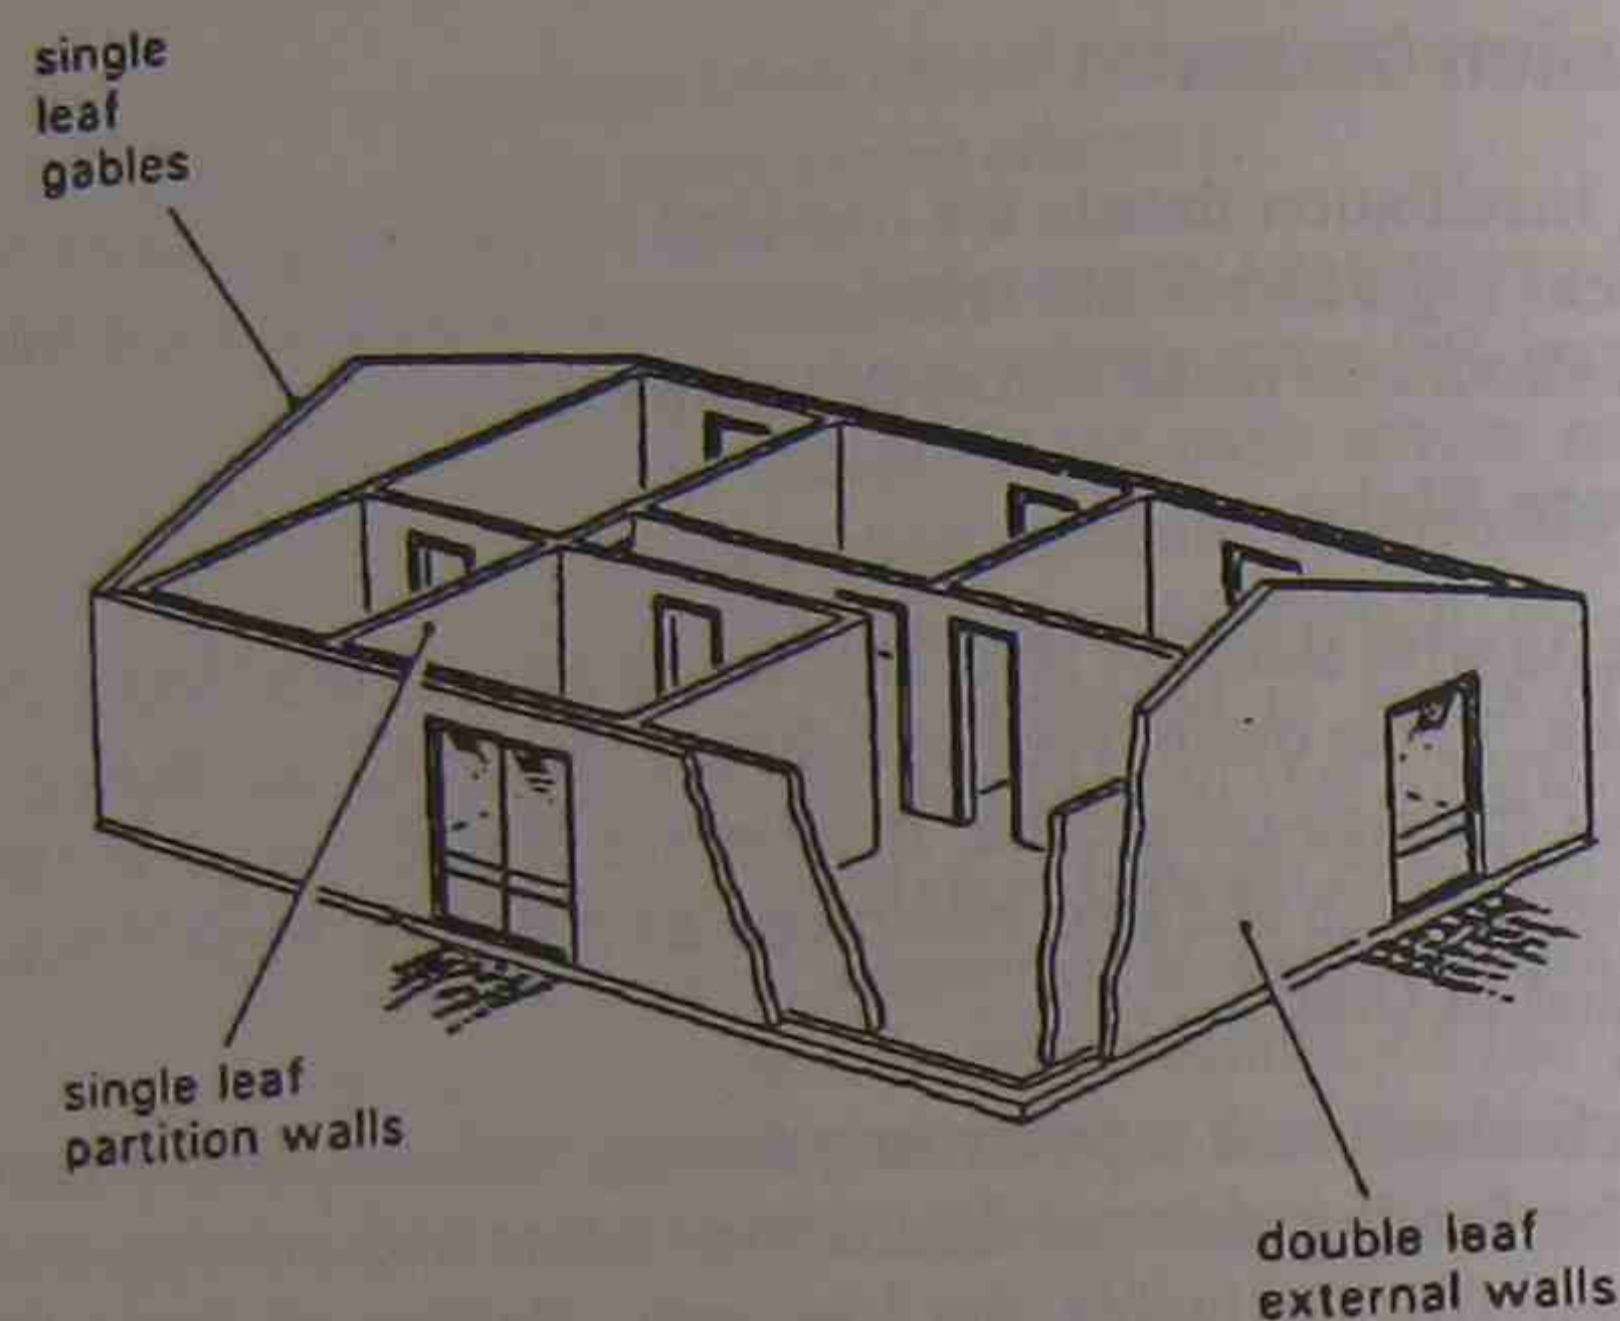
Full masonry construction. (Source: Glass, Mass and Insulation Council, 1985).
